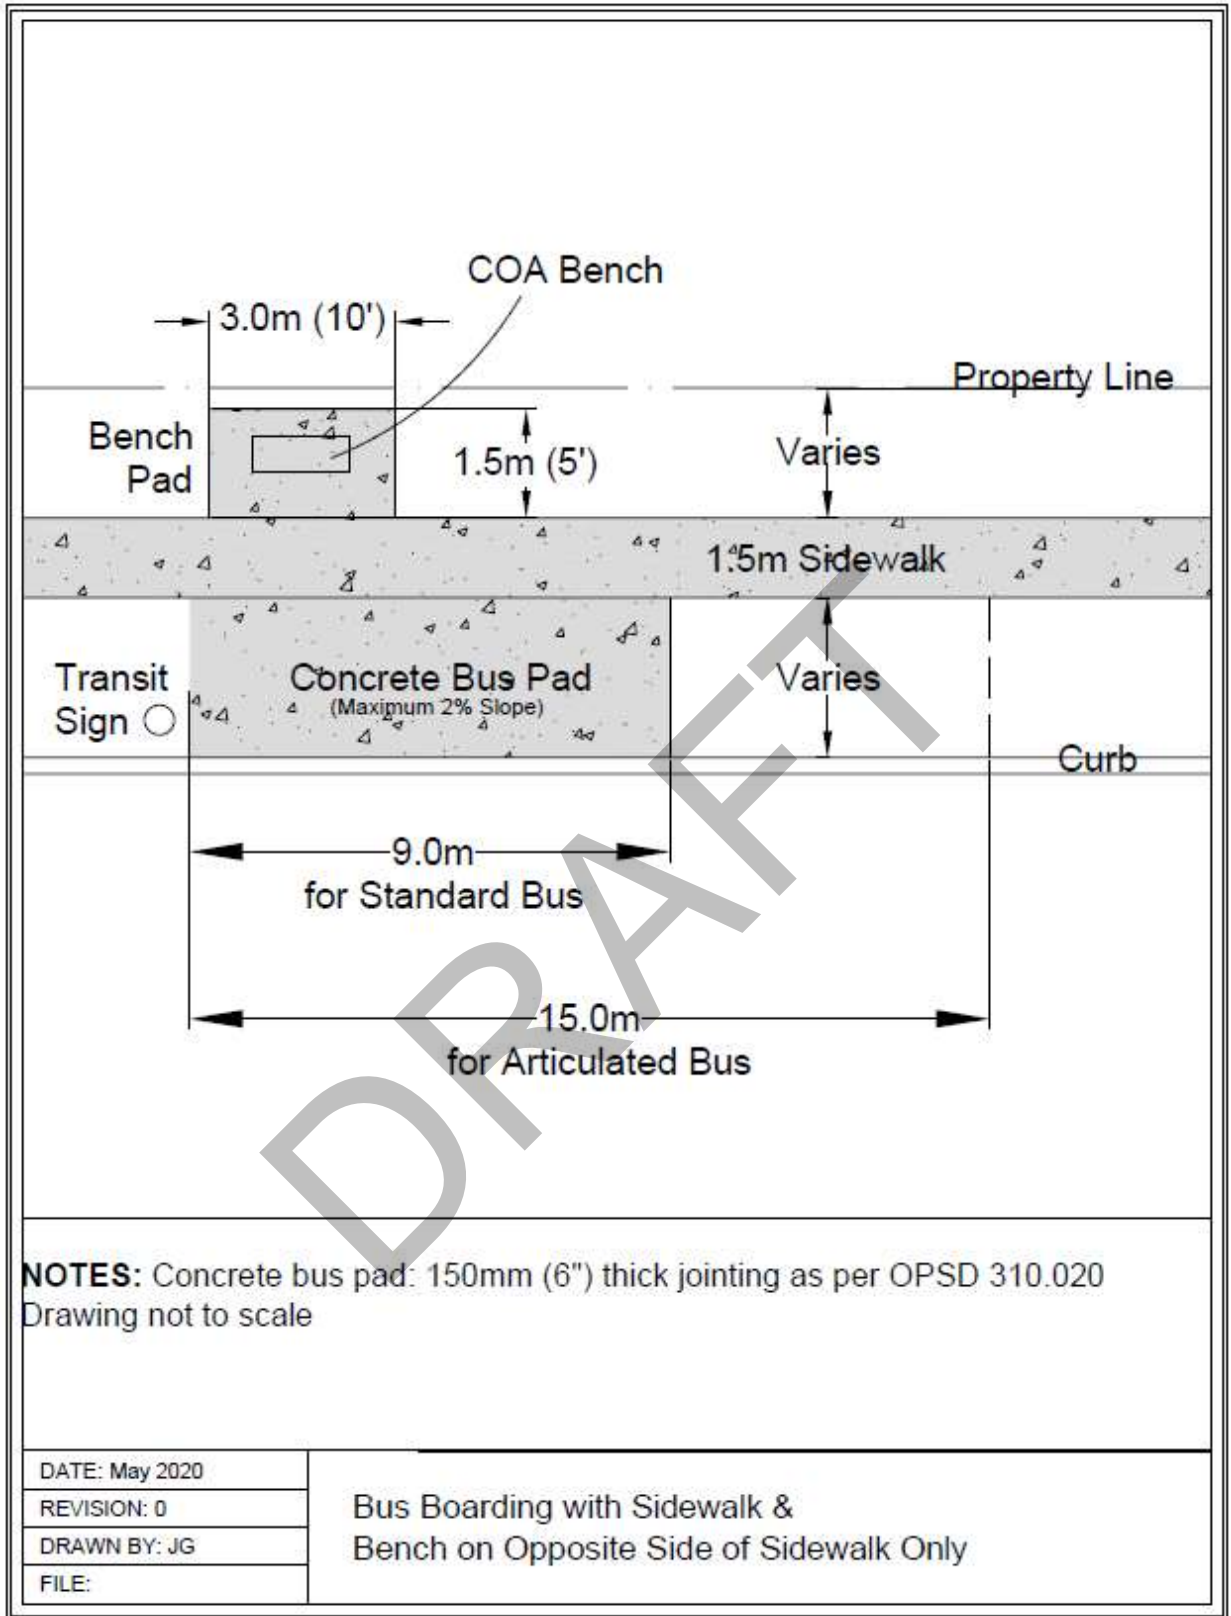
Diagram of bus boarding with sidewalk and bench on opposite side of sidewalk only.
